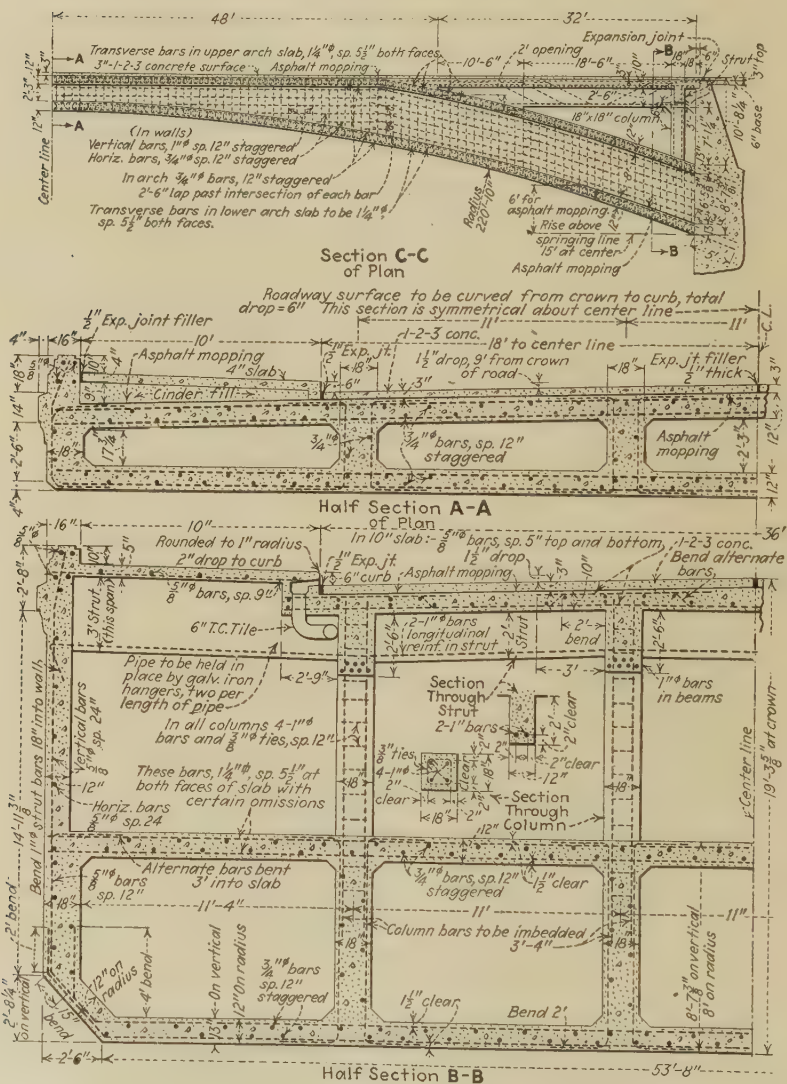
ELEVATION, PLAN AND DETAILS.
